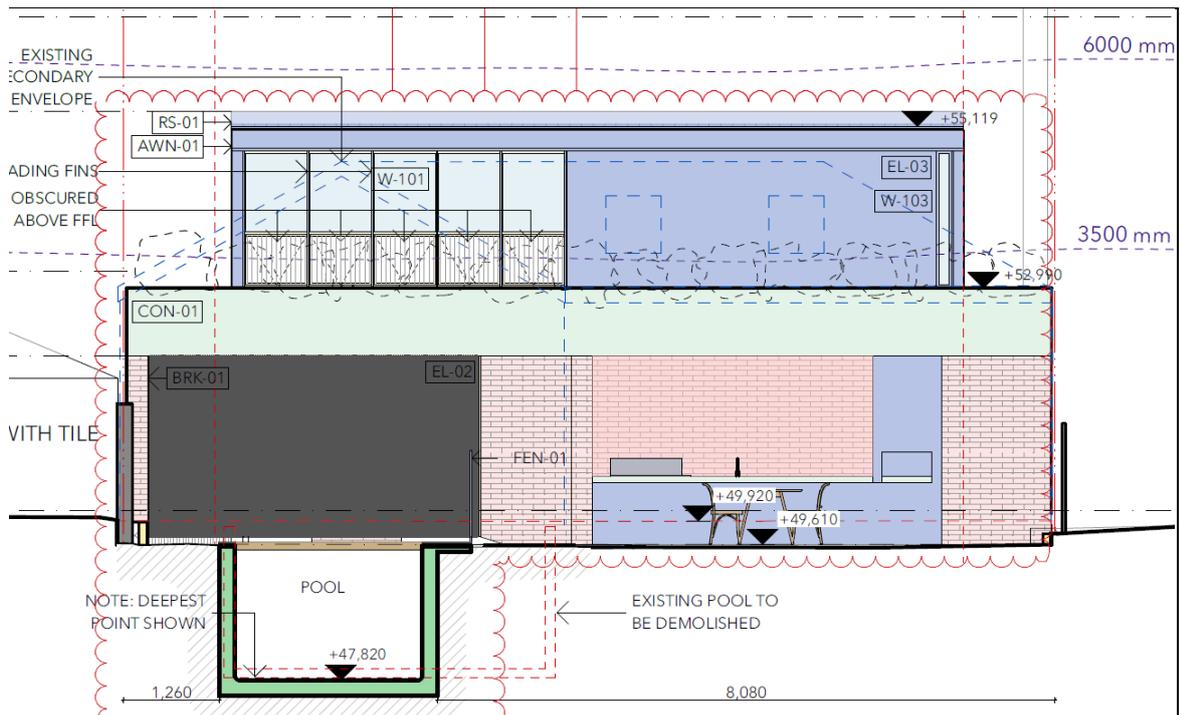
Proposed Modified Northwest Elevation (rear of the secondary dwelling/garage)
